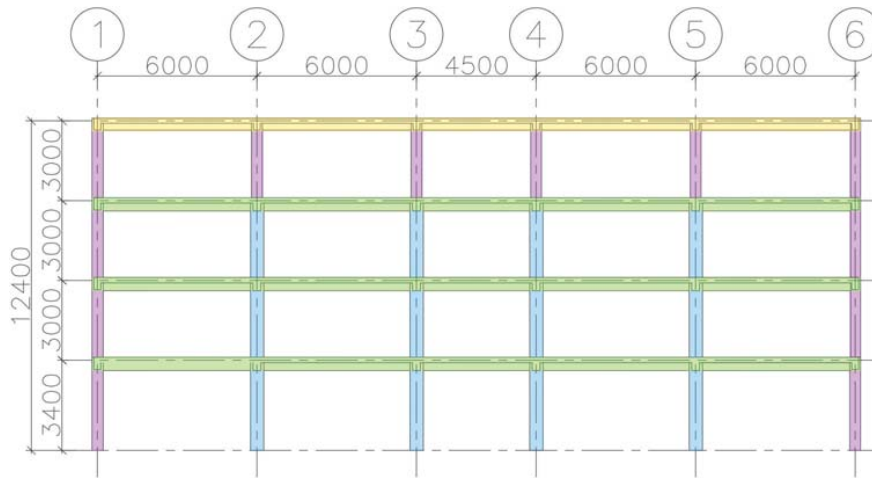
Elevation view of the analyzed frame (all measurements in mm)
